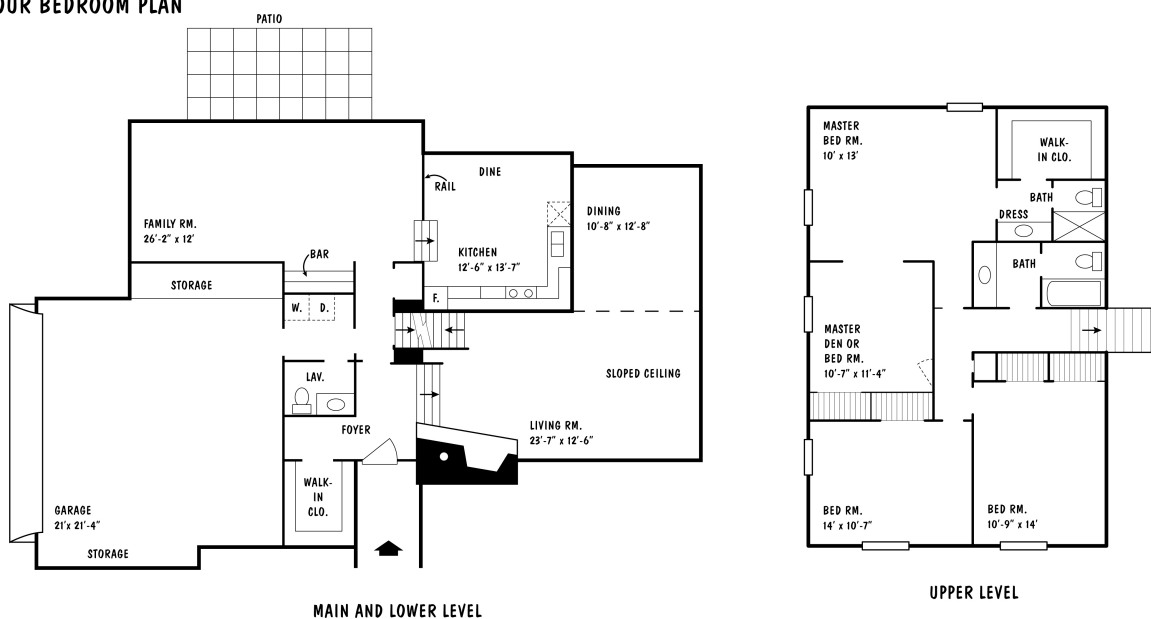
Large split-level house, 1960s source: Ethan 2010 (floor plan redrawn by author)
